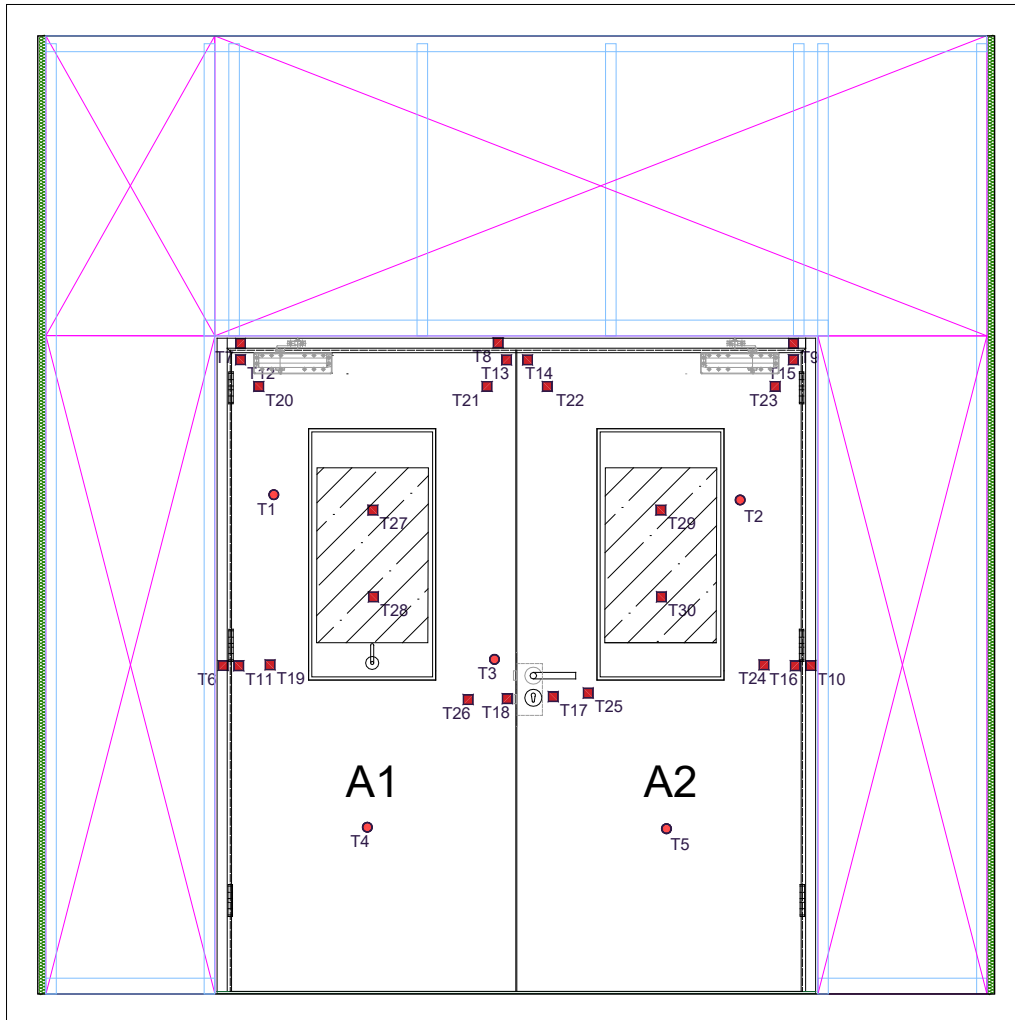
Layout of instrumentation viewed from the unexposed surface of the test construction
